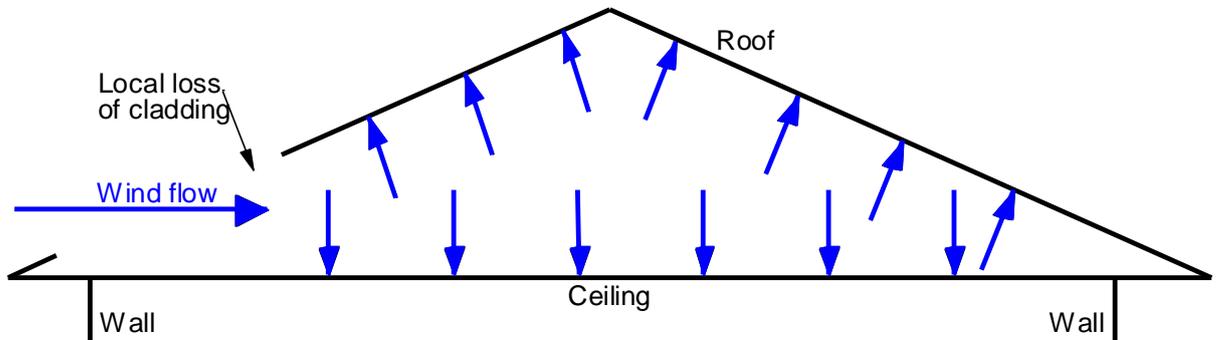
Pressurisation of roof space due to local loss of roof cladding
